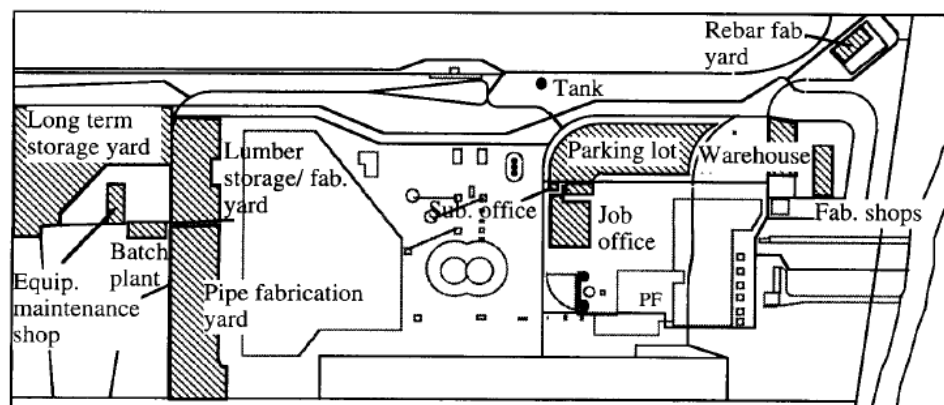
Final construction site layout (Cheng & O'Connor, 1996)
